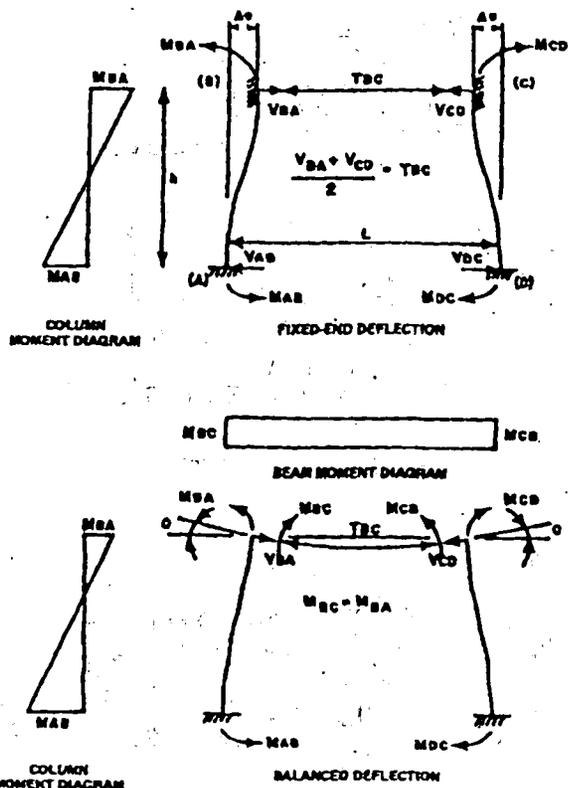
Flexure of a simple frame induced by beam shortening
